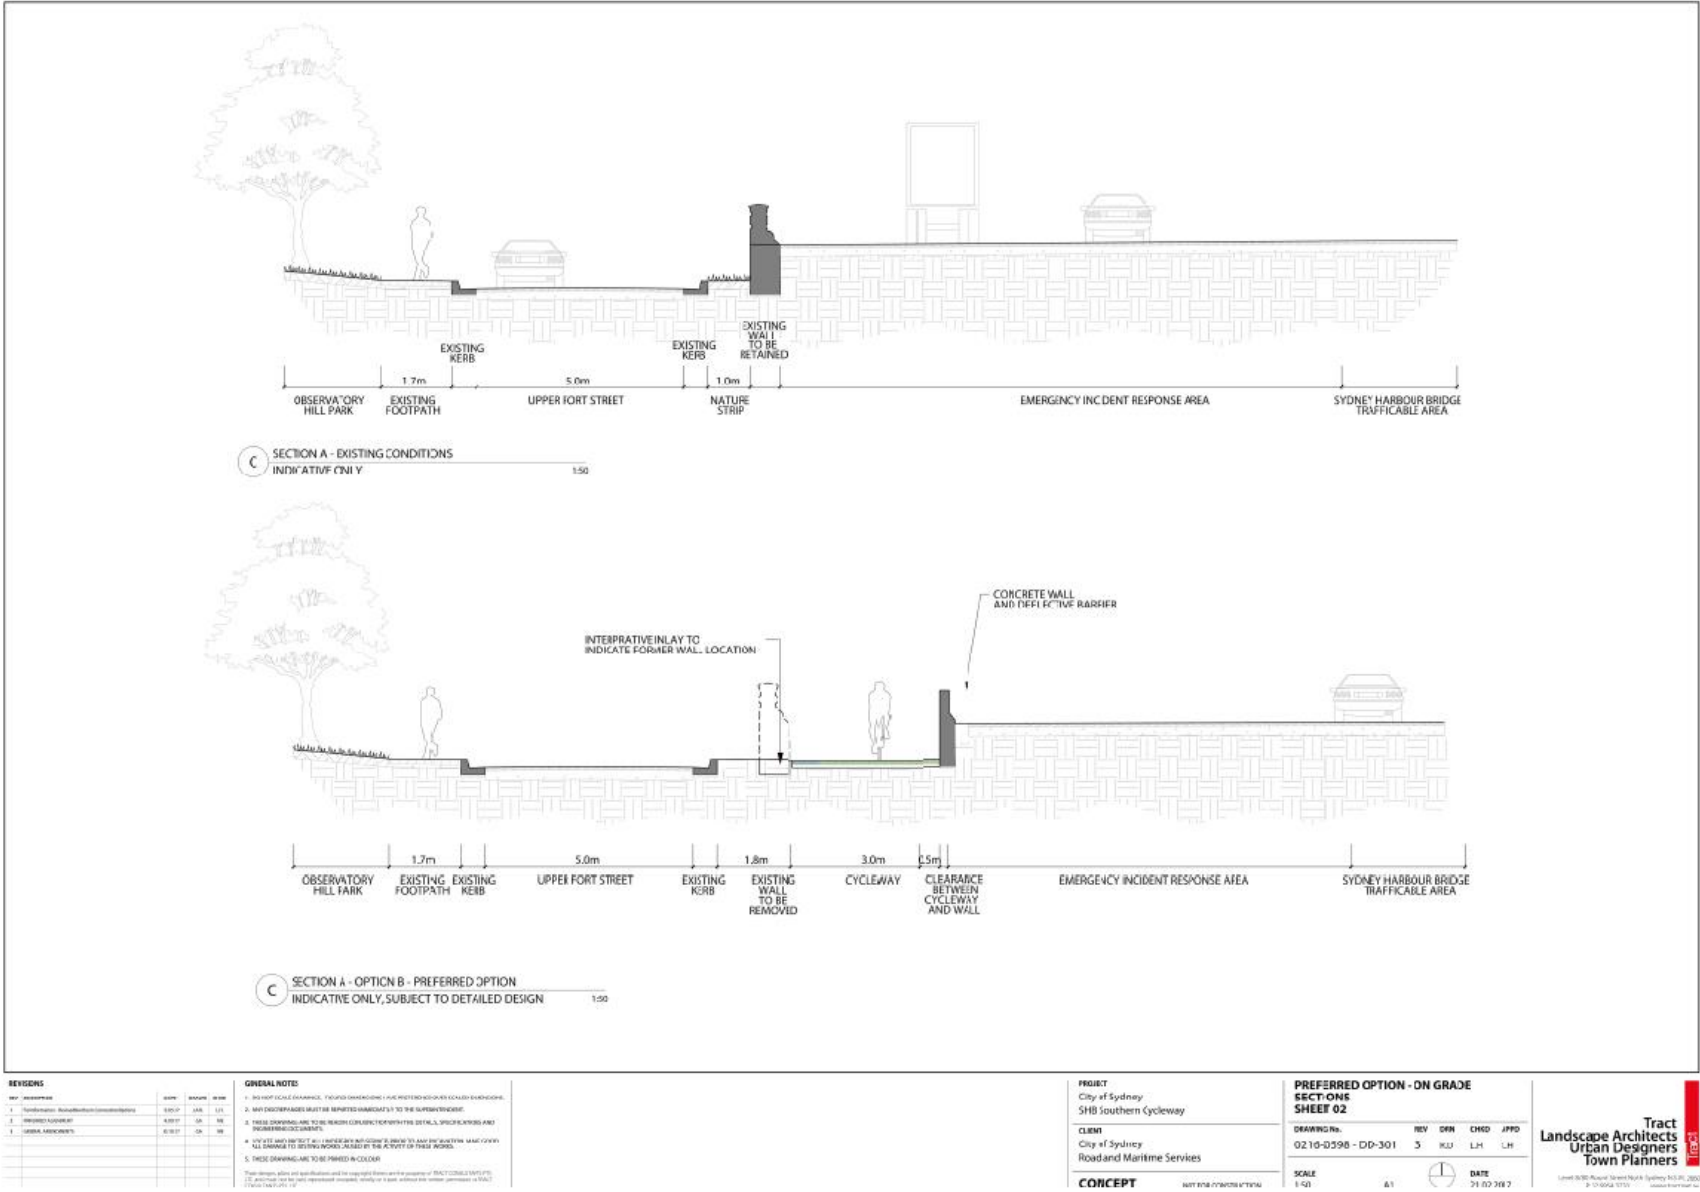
Sections of proposed SHB southern cycleway. (Source: Tract)
